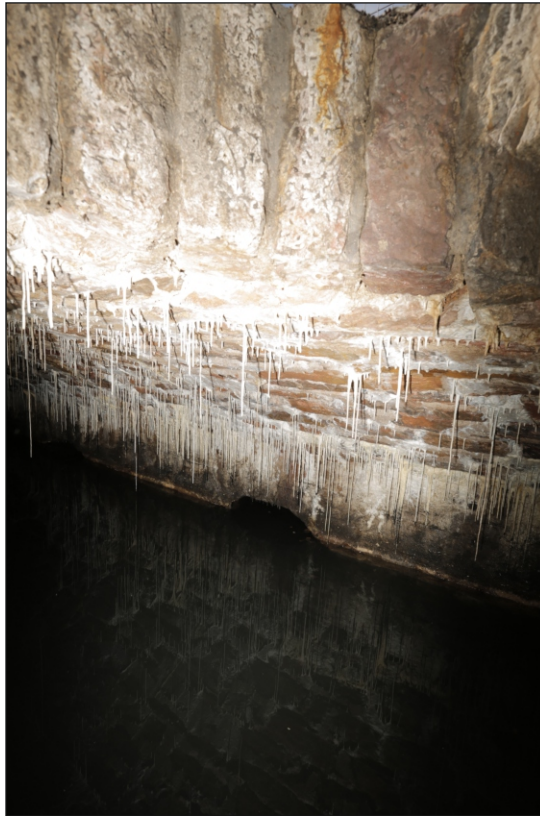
East chamber showing construction of central dividing wall and top of connecting arch
